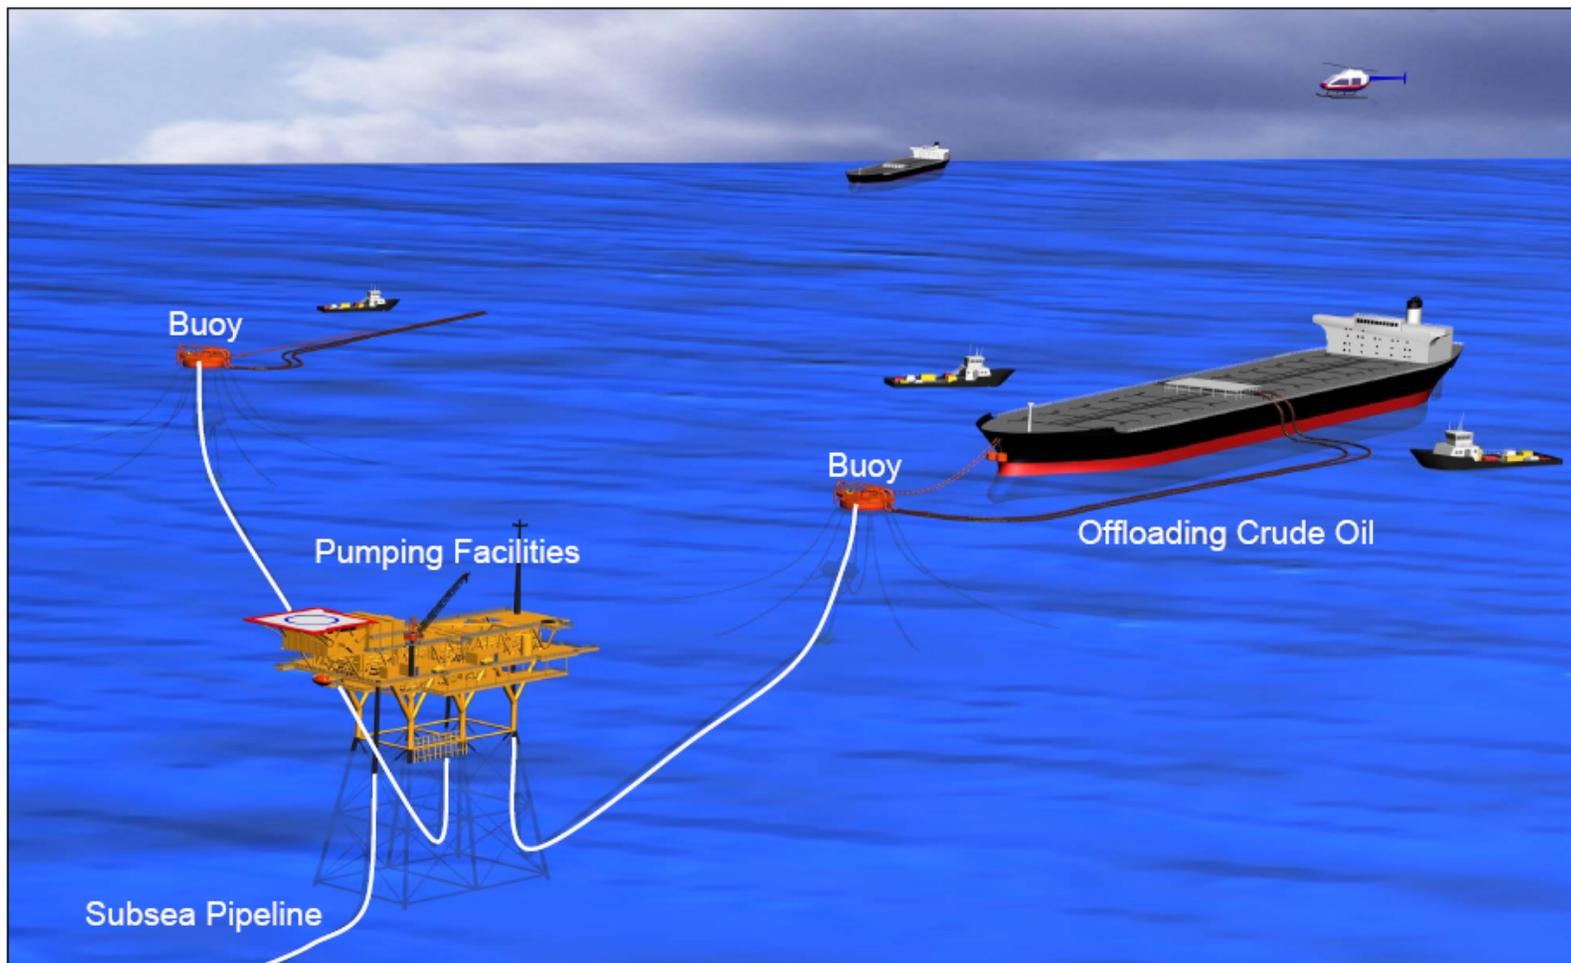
Offshore Terminal Field Layout Drawing
